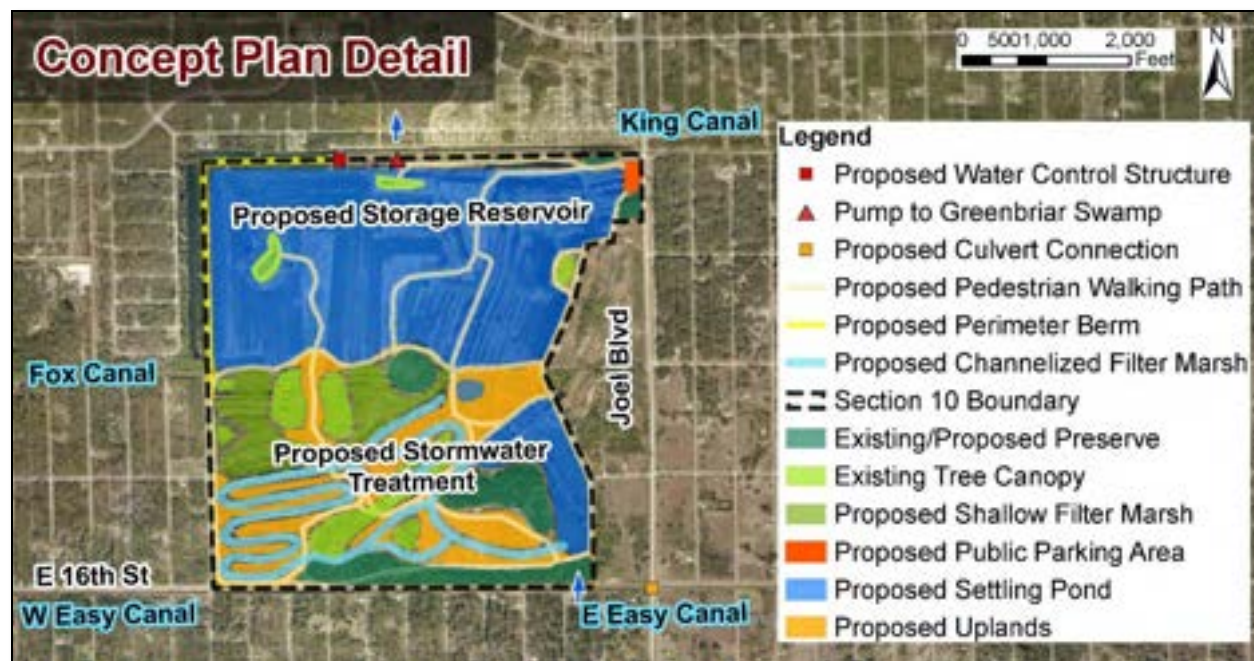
Concept Plan Detail, 1.1.3 GS-10 Stormwater Quality Reservoir
